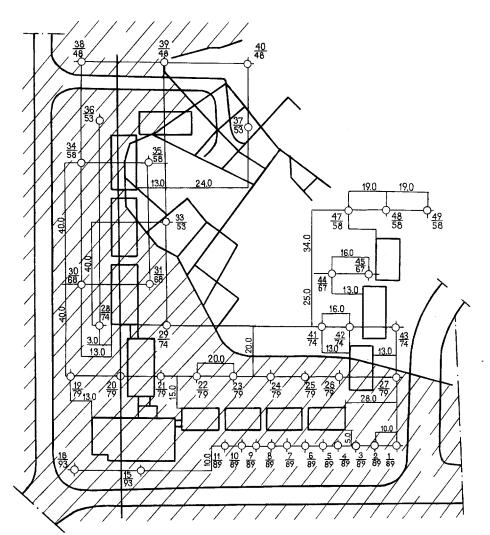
Grouting hole arrangement. Hatched area = mined-out strata; rectangles = buildings; ○ = grouting holes. (Not to scale.)
